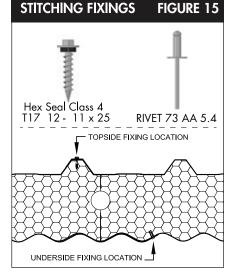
Details: Hex Class 4 - 10 - 12 x 25 - Type T17 no seal washer Spacing: Used at 300mm centres on the underside of the sheet lap
